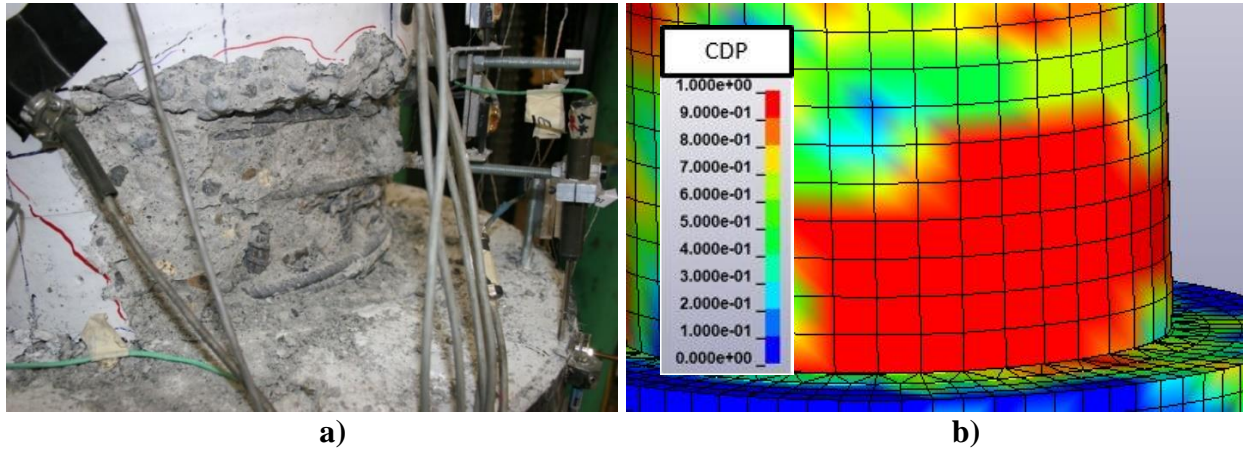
Specimen 30-21-R Exposed Northern Longitudinal Reinforcement and Compressive Damage at 5.5% Drift: a) Observed and b) Simulated
